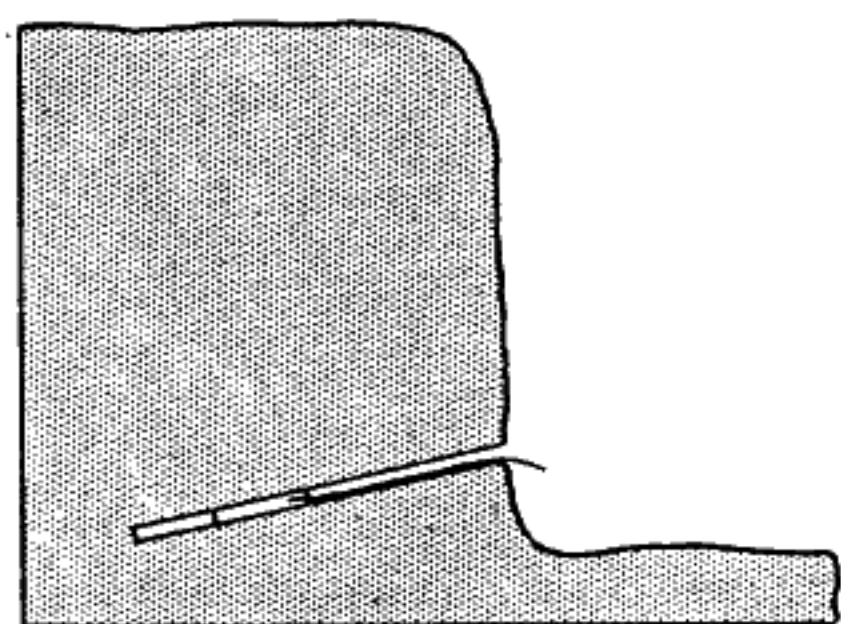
Location of a flat or "horizontal" bore hole in a road cut. When a bulky explosive is used, the hole is sprung.
